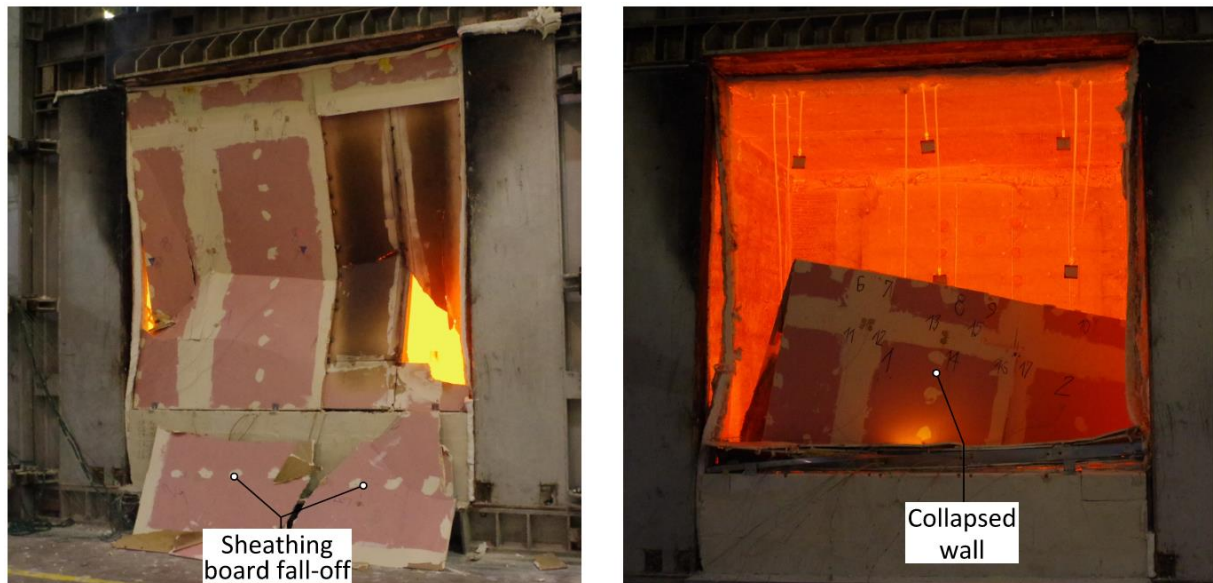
Pictures of LSF wall under testing showing extent of deflection for the one-sided fire exposure condition
